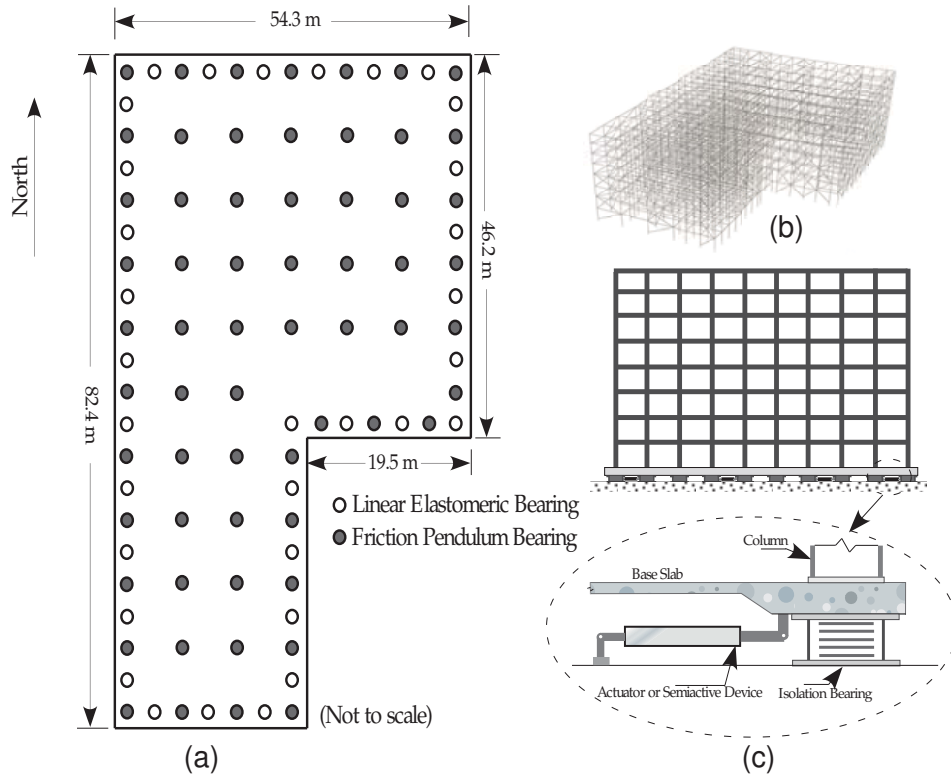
(a) Isolation plan; (b) FEM model of superstructure, and (c) Elevation view with devices [81].
